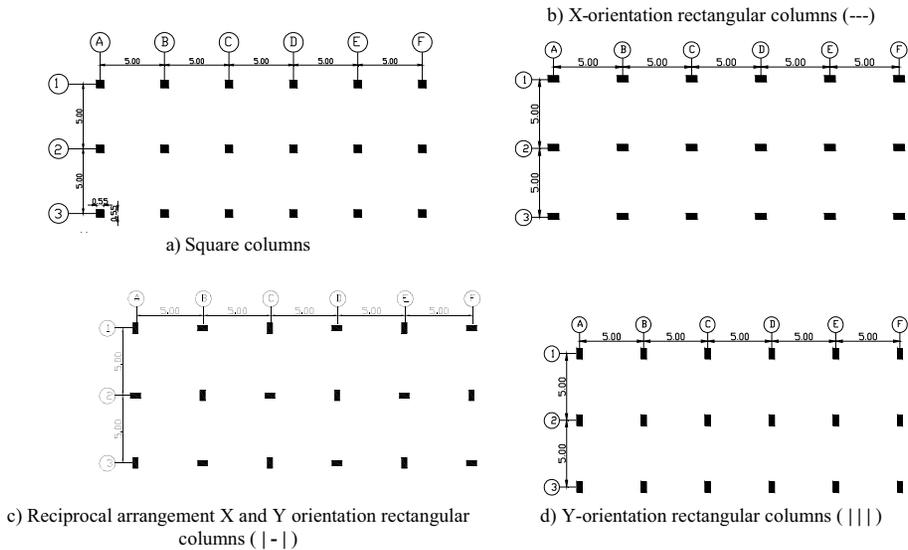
Rectangular floor plan (ratio 2.5) models with different column arrangements and orientations
